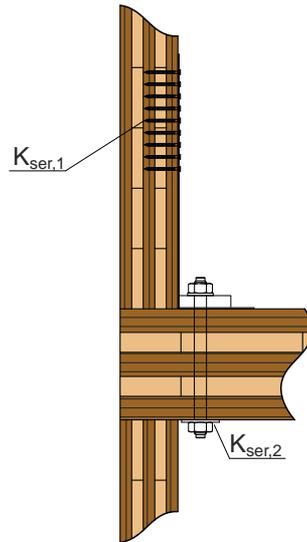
wall-ceiling-wall connection joint with the hold down '480-M20' and the prevailing stiffness modulus
